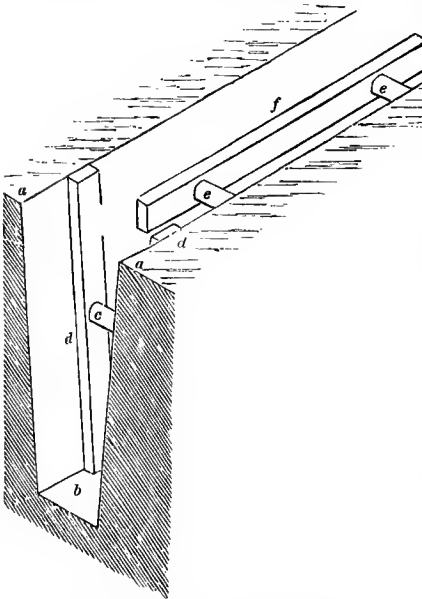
Positions of planks and props in a deep drain to prevent earth falling in.
